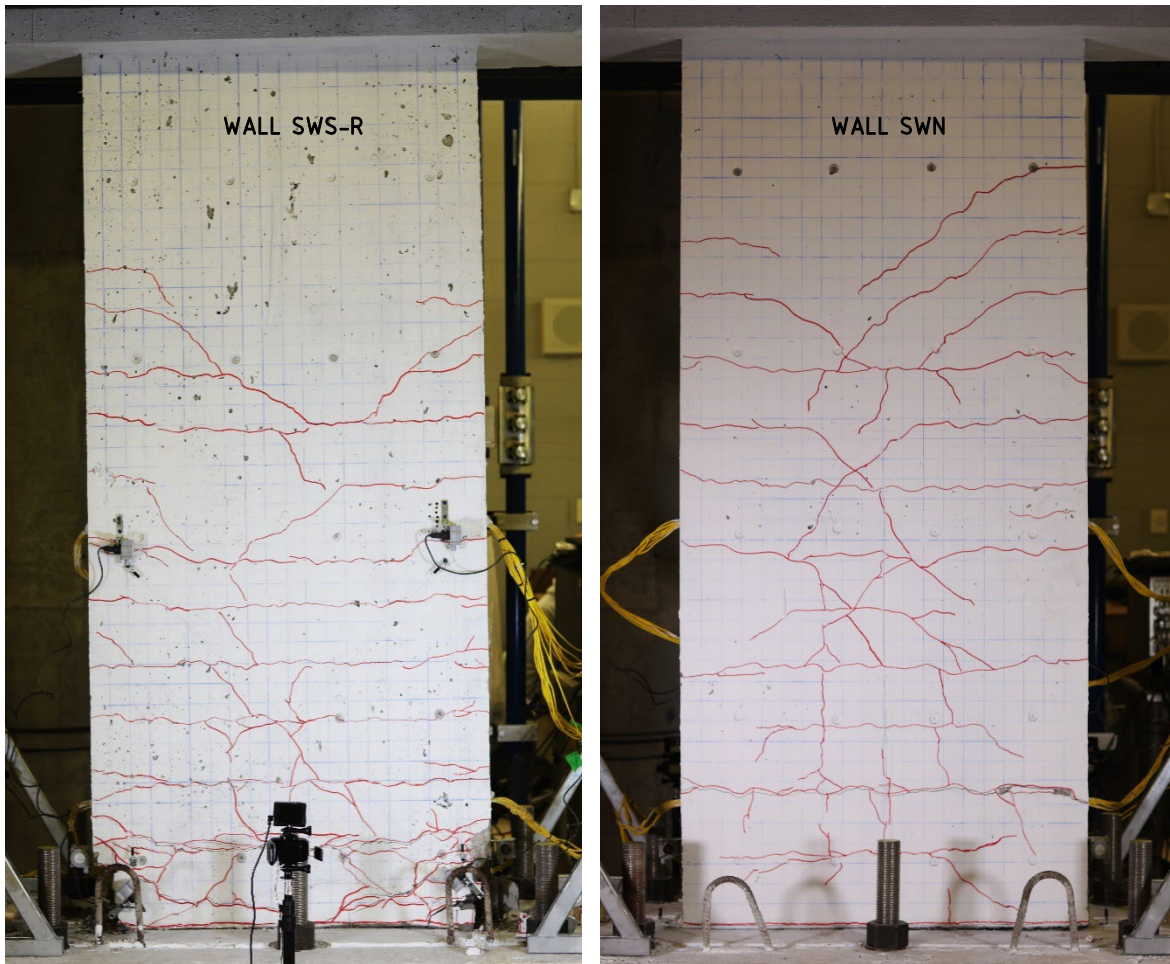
Crack patterns at 2.5% drift of walls SWS-R (left) and SWN (right).
